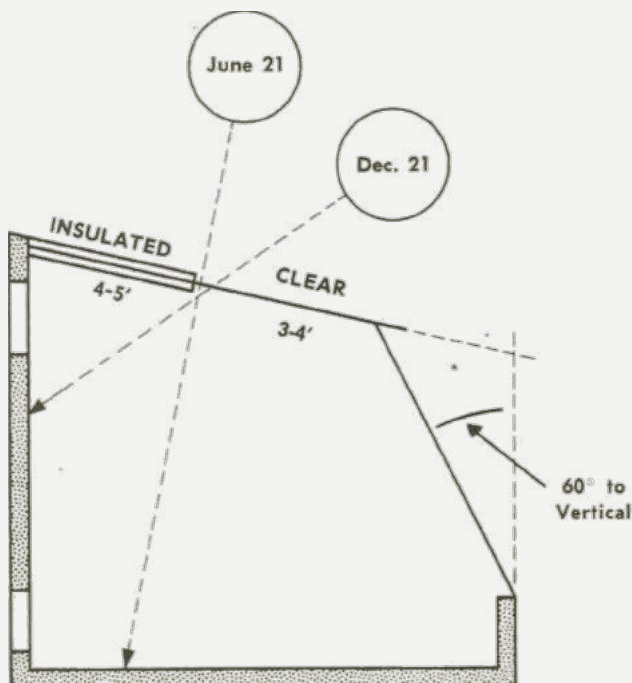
Greenhouse Roof (from Solar Greenhouse)
